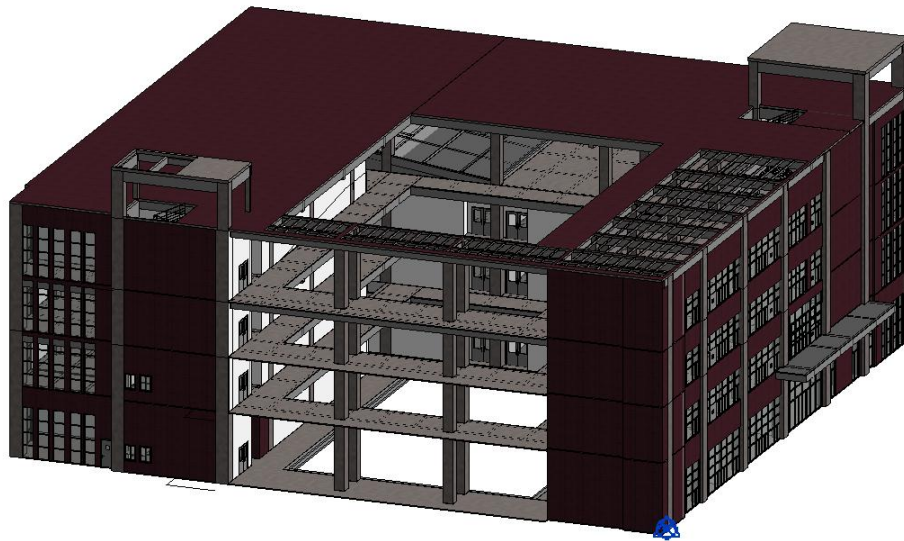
Figure of BIM architectural model in Zhengde Building D
